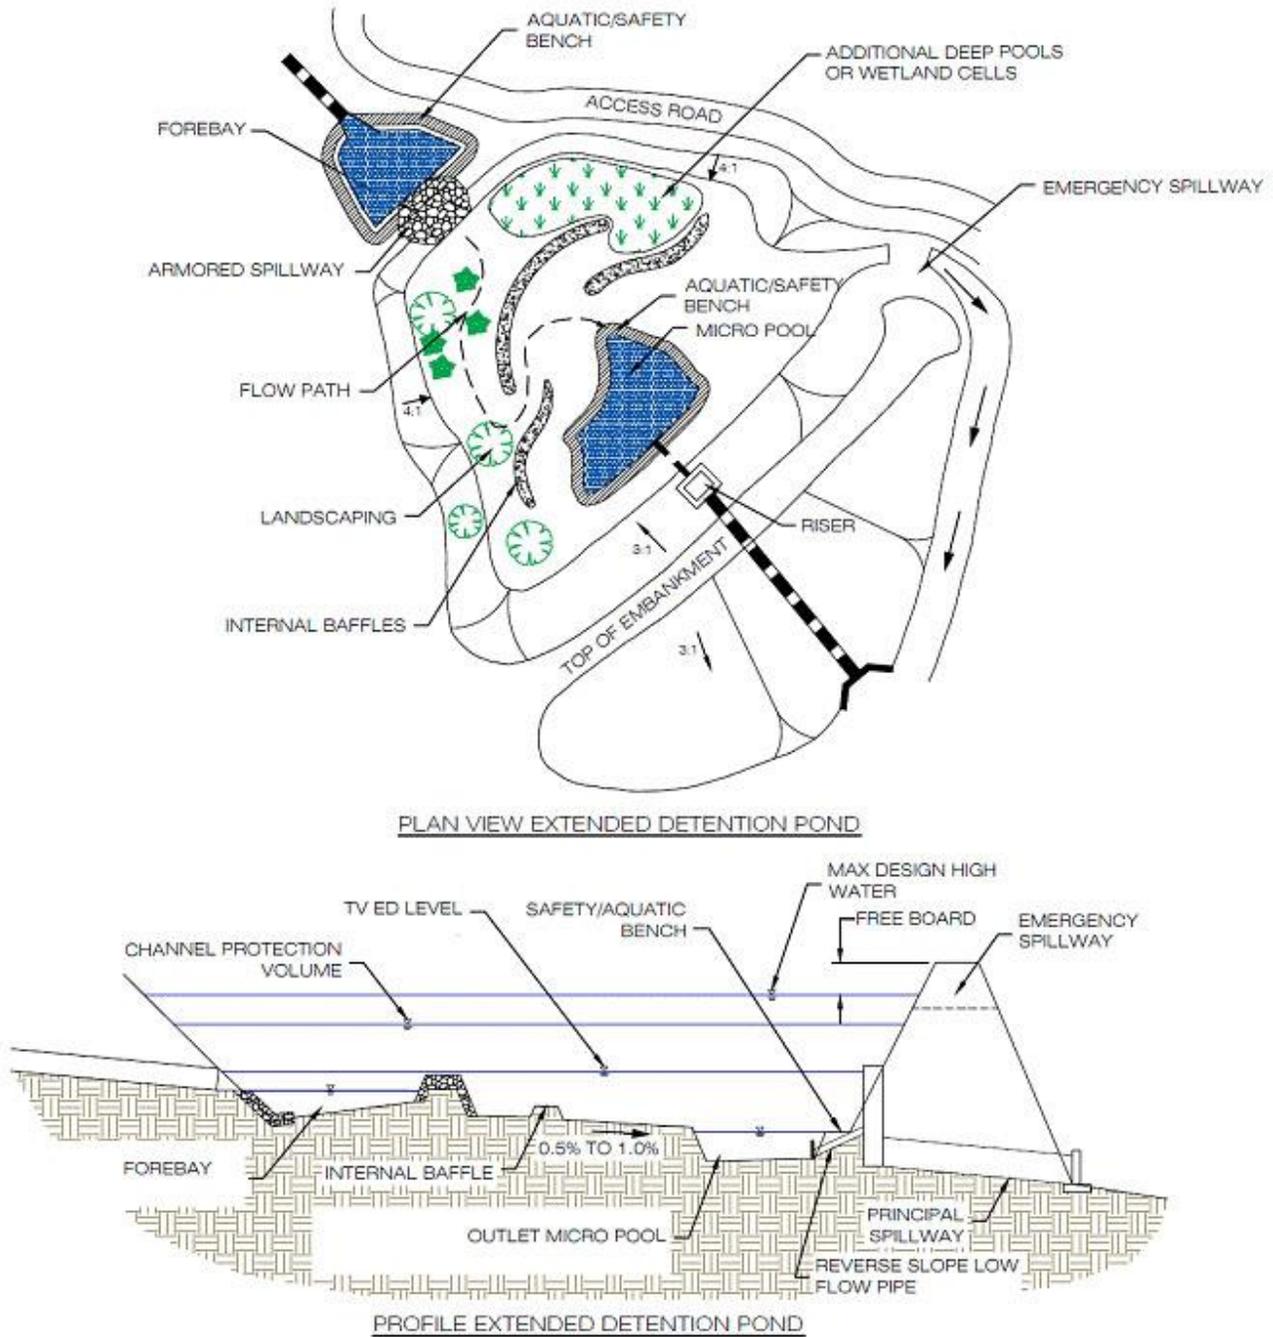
Typical Extended Detention Pond Details (source: VADCR, 2011)
